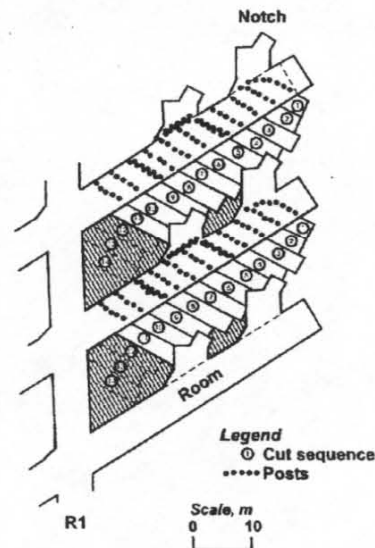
Pillaring plan in E19 that was changed because of floor heave
